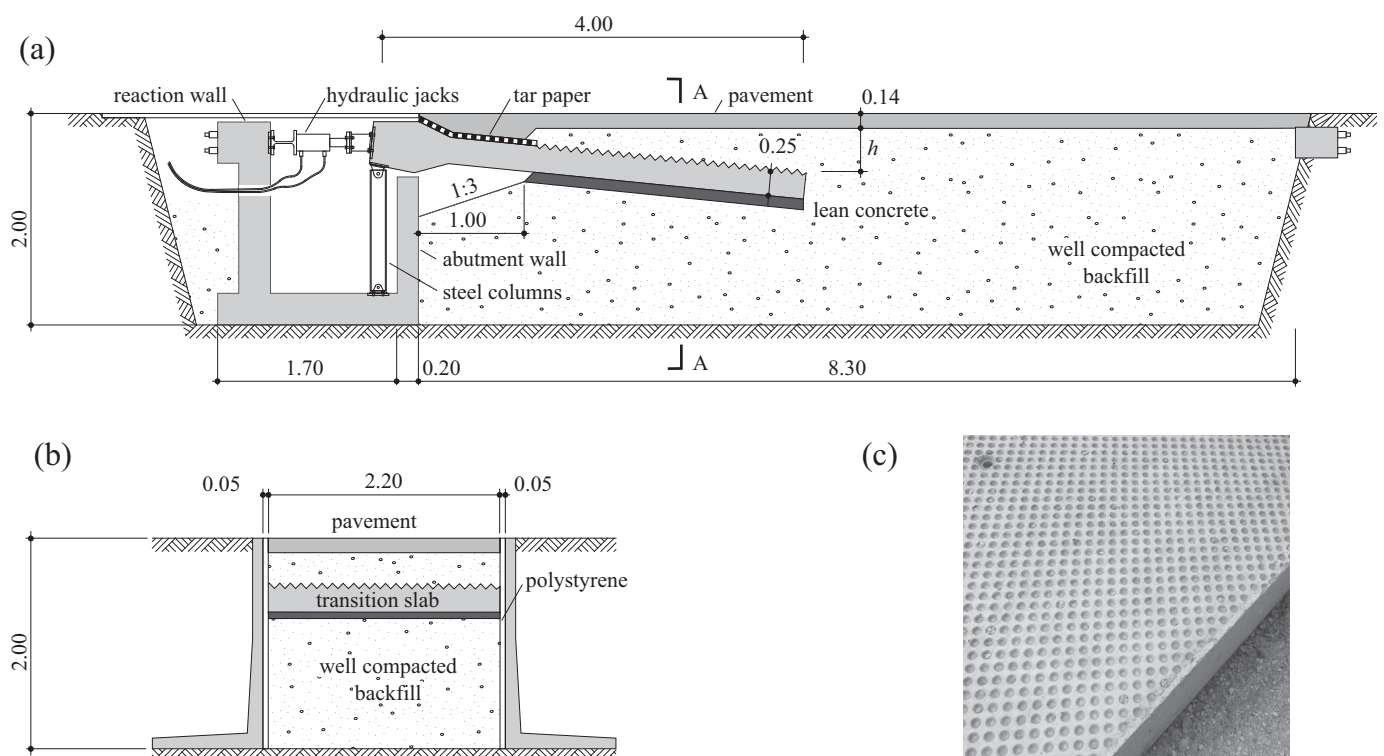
Setup for TST2 (dims. in m): a) longitudinal section, b) section A-A, c) rough top surface of transition slab
